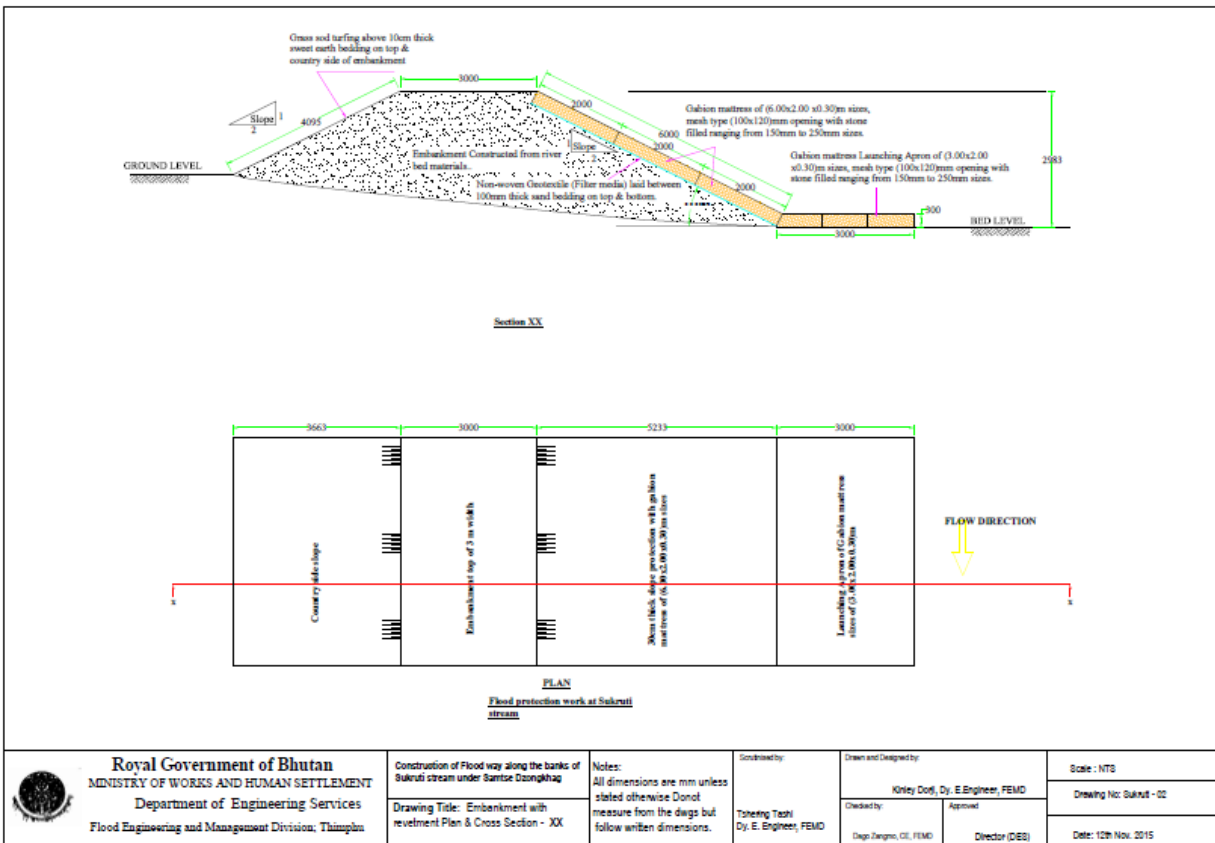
Plan and cross section of flood way along right bank of Sukreti River.
